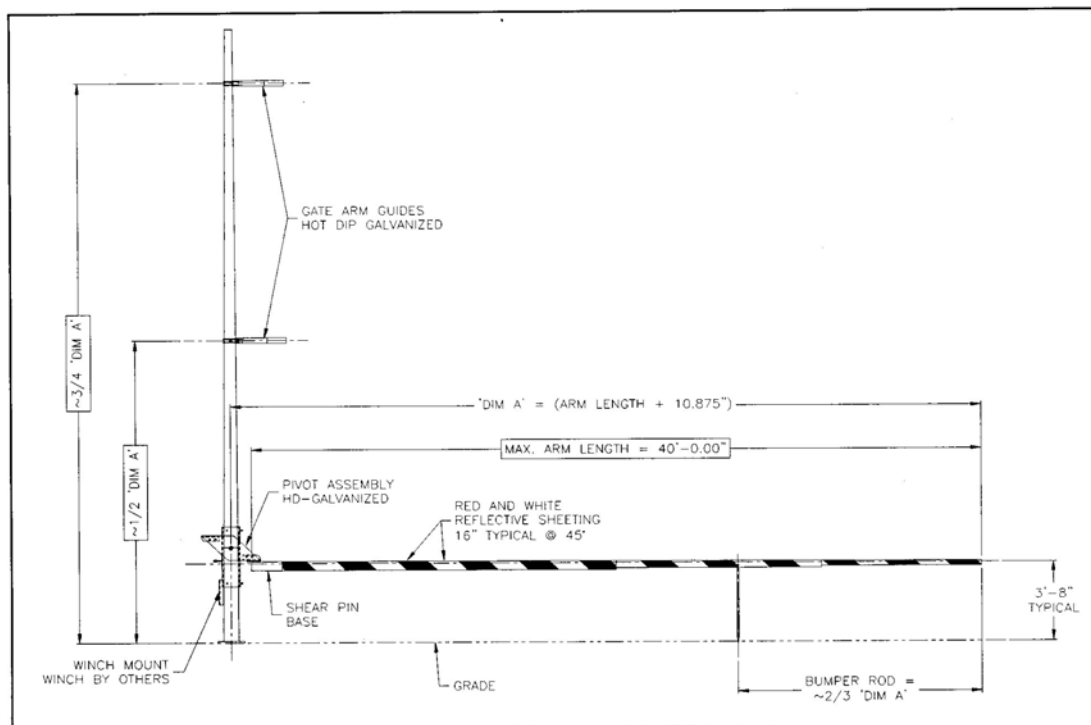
Details of a contraflow gate (Source: "Road, Bridge, and Rail Barrier Gates" 2001).
